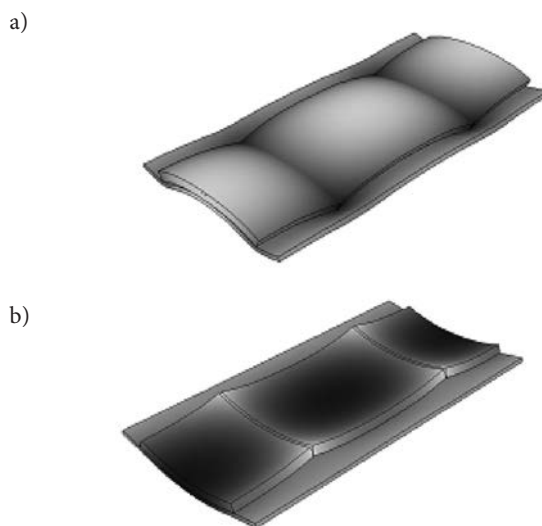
Curling of concrete pavement: a – downward curling; b – upward curling
